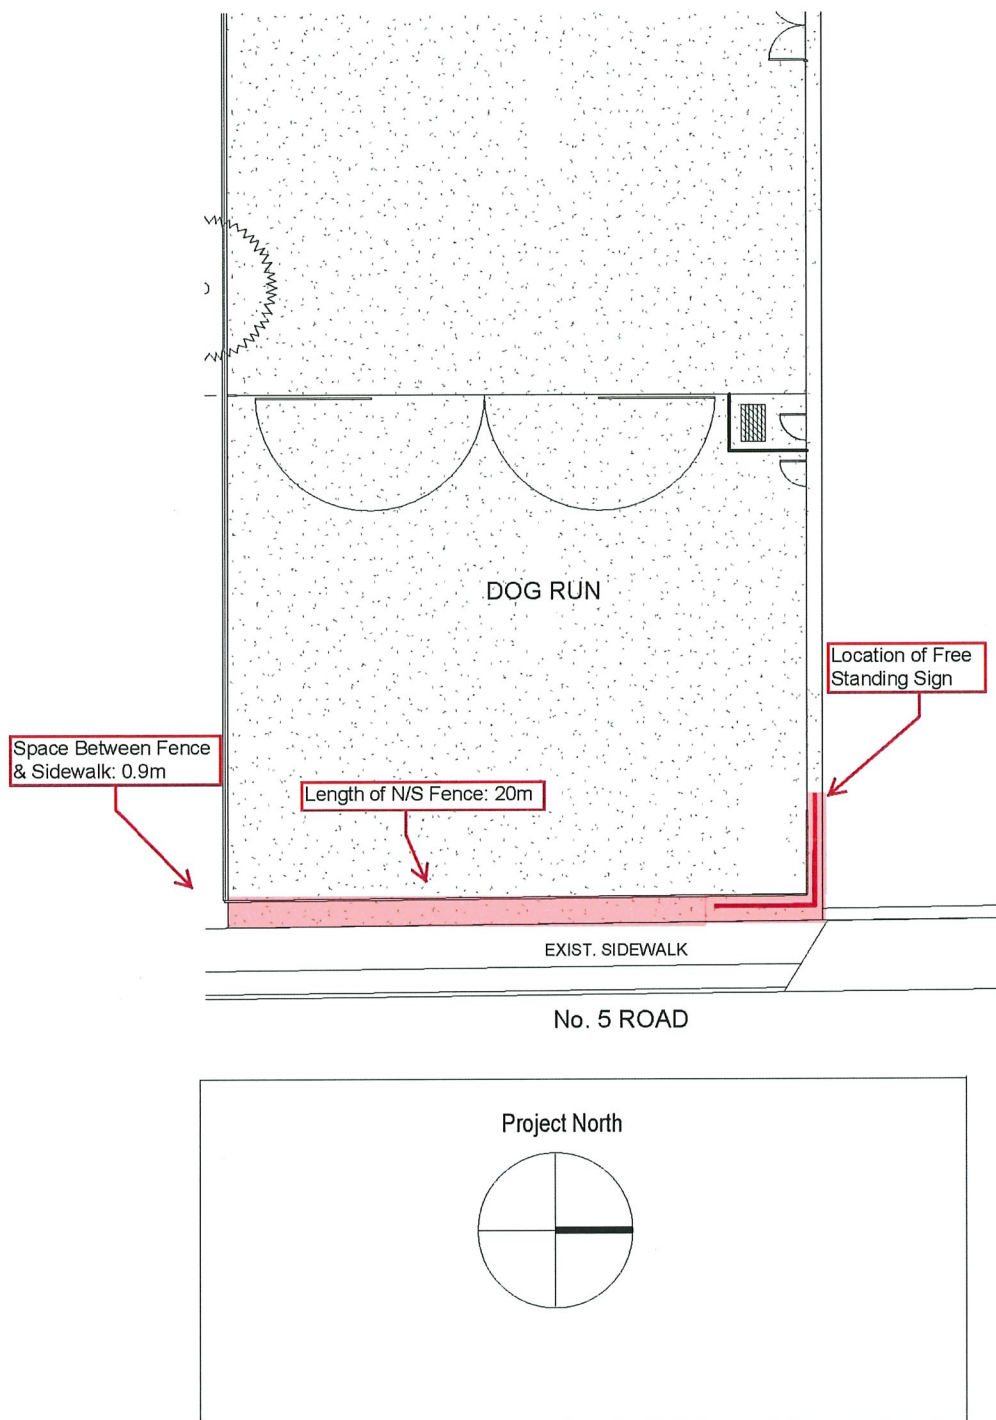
Cropped site plan showing proposed location of public artwork and extent of the east section of chain link fence. The artwork will work with or around the existing free standing sign.
